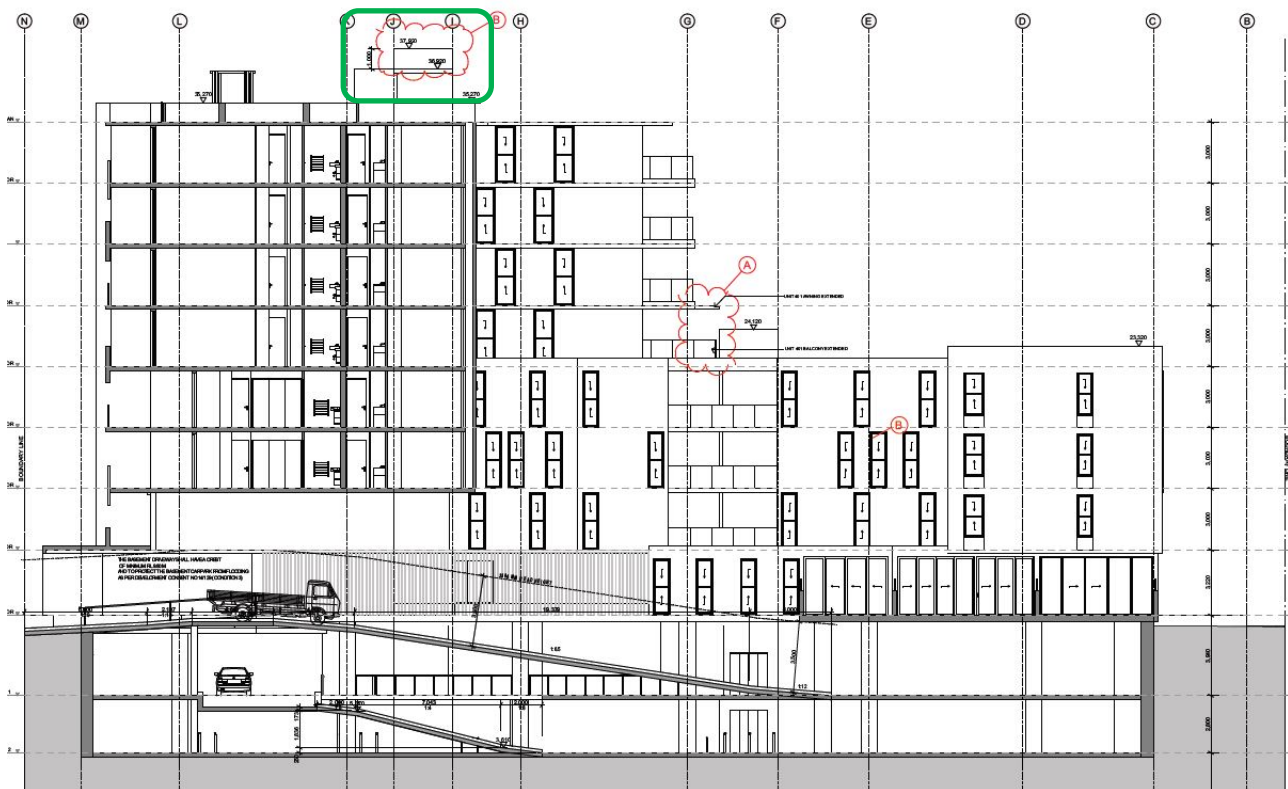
Section with the lift overrun extended by 1.0m highlighted green.
